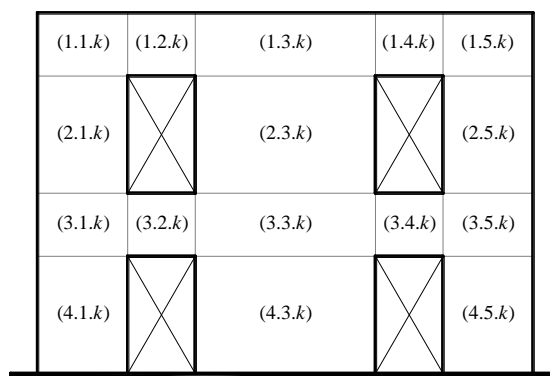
Labelling of panels within the k -th wall of a masonry building
